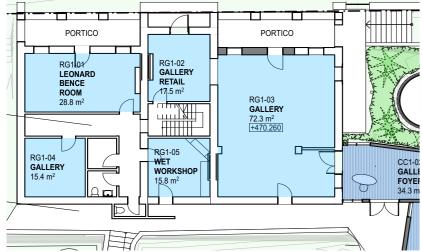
PROPOSED GROUND FLOOR PLAN OF BURRA REGIONAL GALLERY
